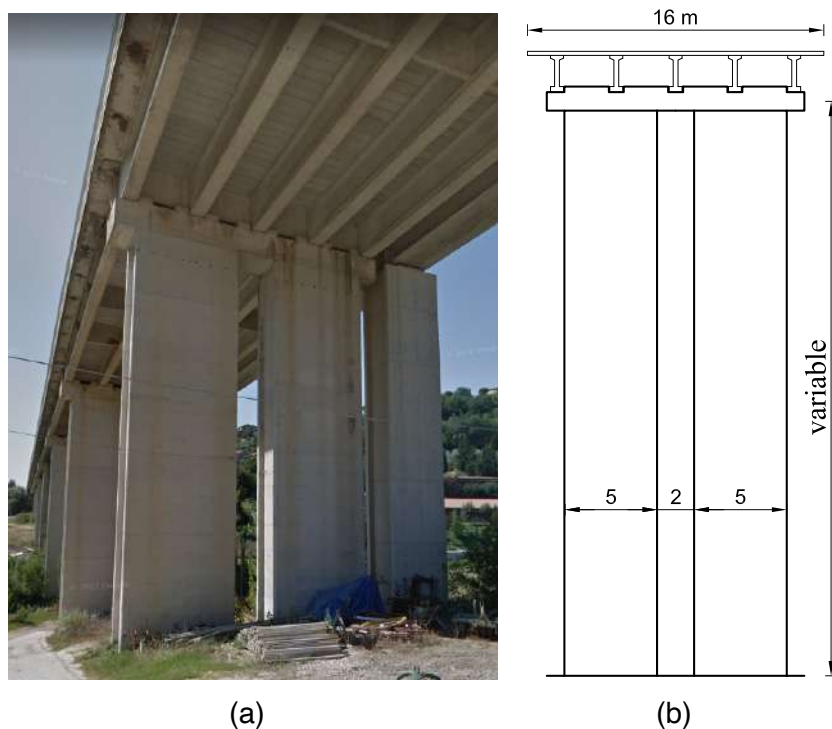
Cesi Viaduct: (a) View of the bridge; (b) Geometry and side view of bridge pier
